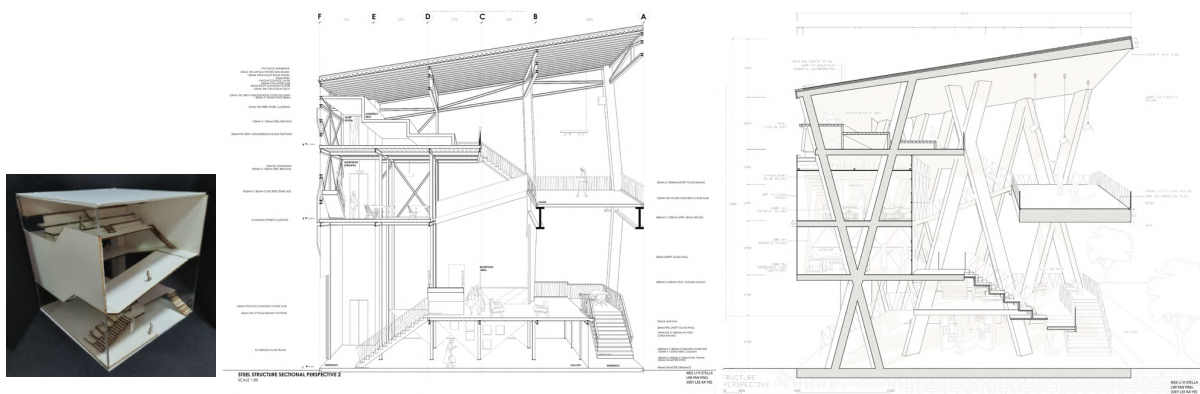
Section perspective drawings in 1/50 (steel structure and RC structure)
